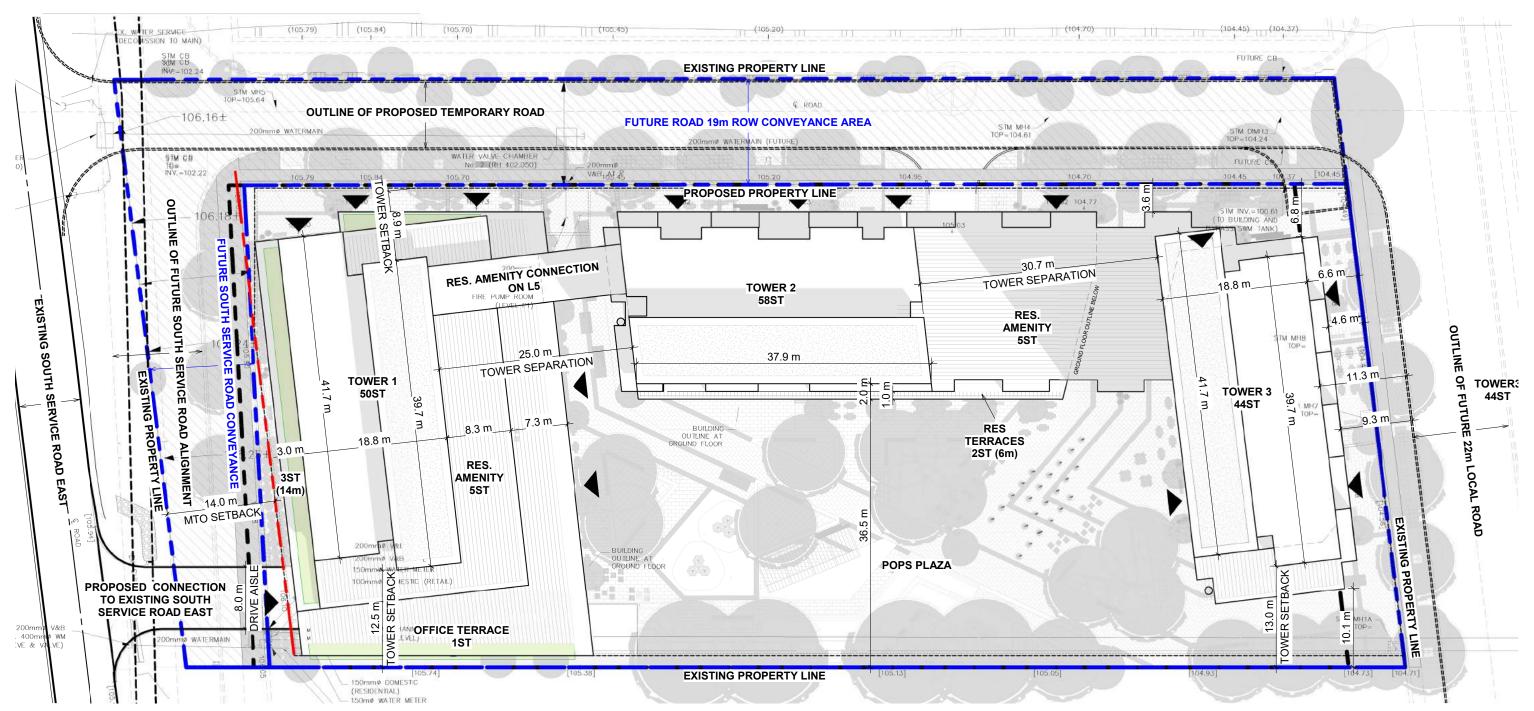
Site Plan - Prepared by: (Sweeny&Co. Architects)
